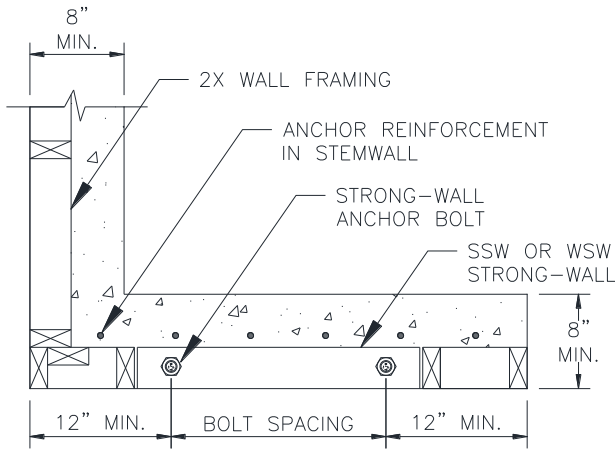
Strong-Wall at Edge of Concrete – Plan View
